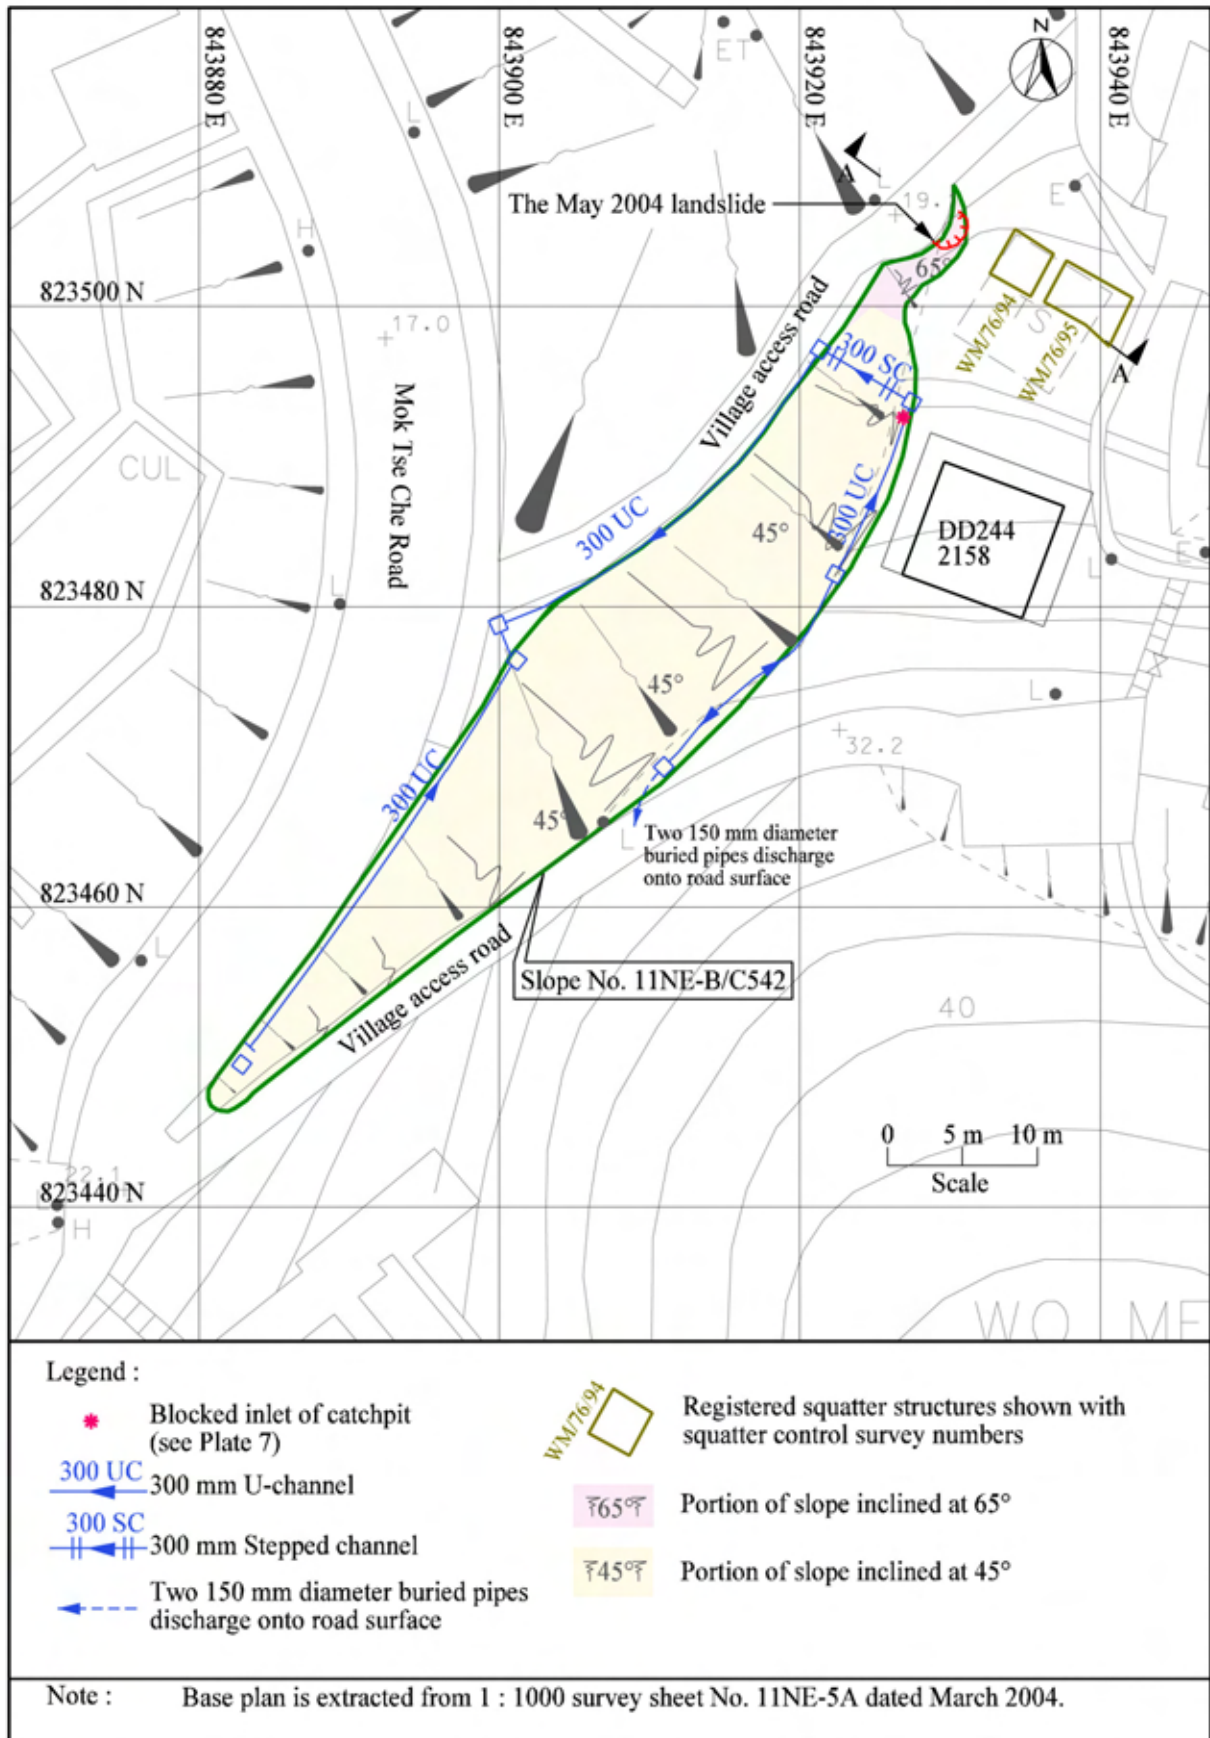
Site Location Plan (Slope No. 11NE-B/C542)
